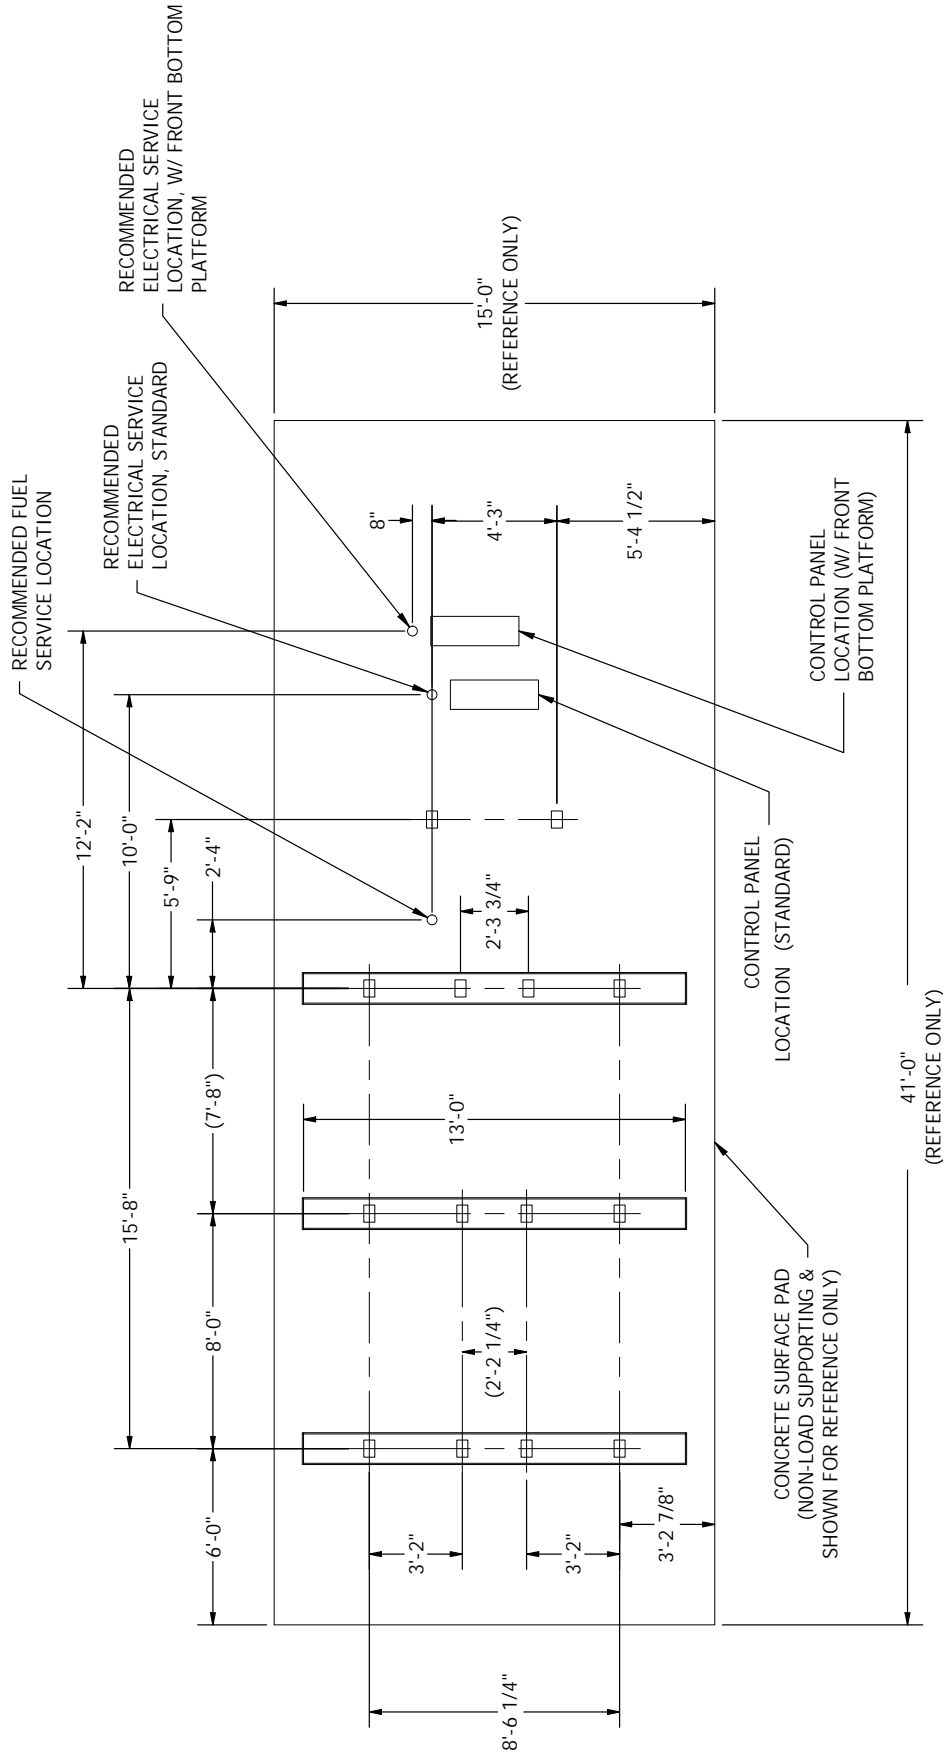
Load Point (Anchor Legs) Layout for Dryer Models D16160
